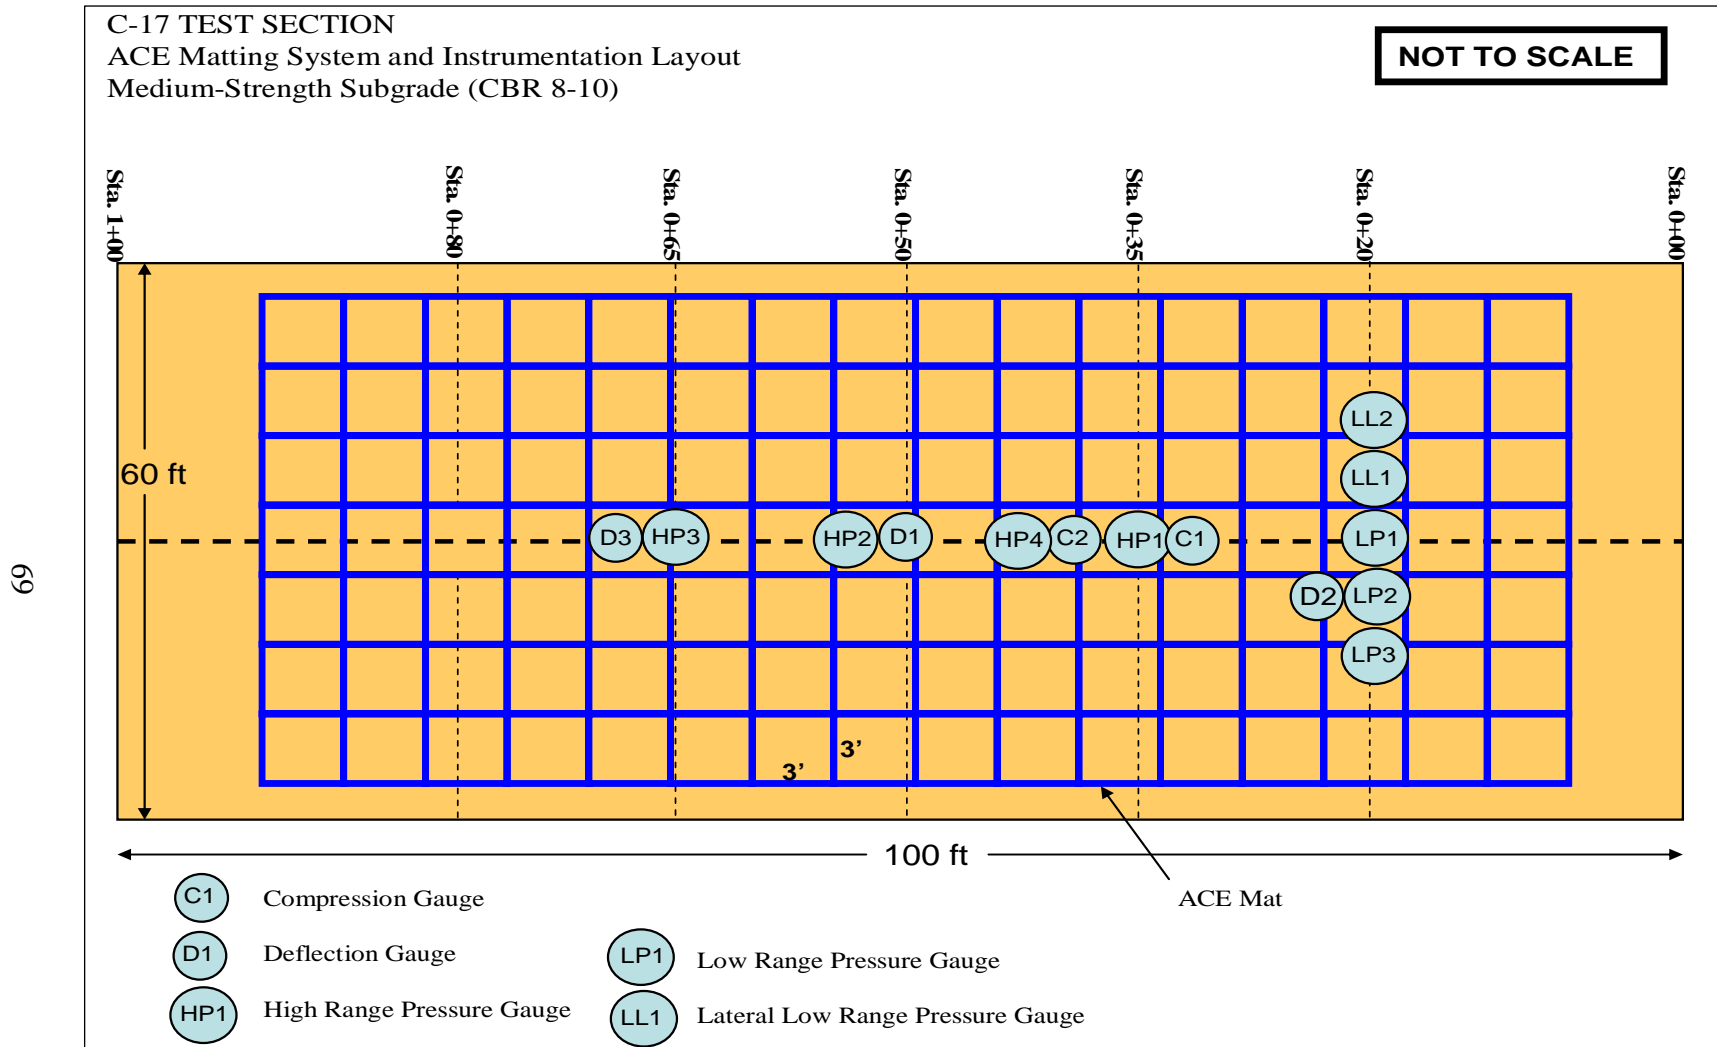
Test Section/Instrumentation Layout – ACE-Mat™ System – Silty Sand Test Section
